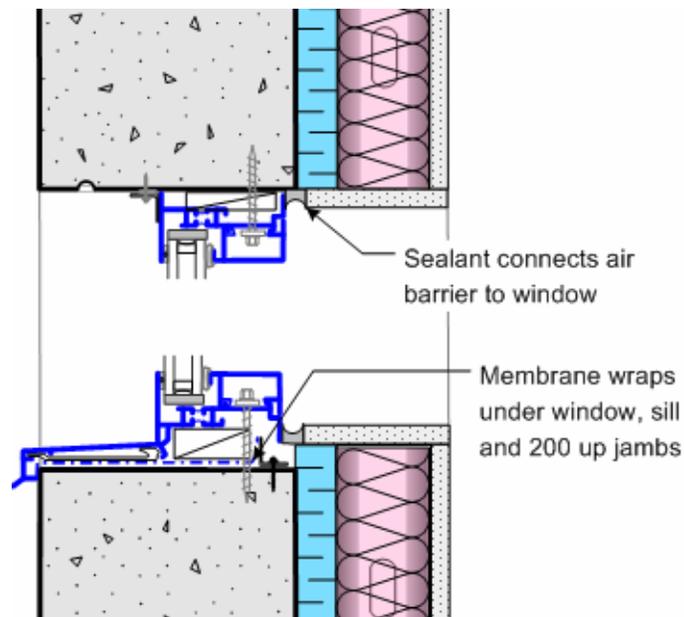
Reinforced Concrete Shear Wall with Drained Window Penetration
